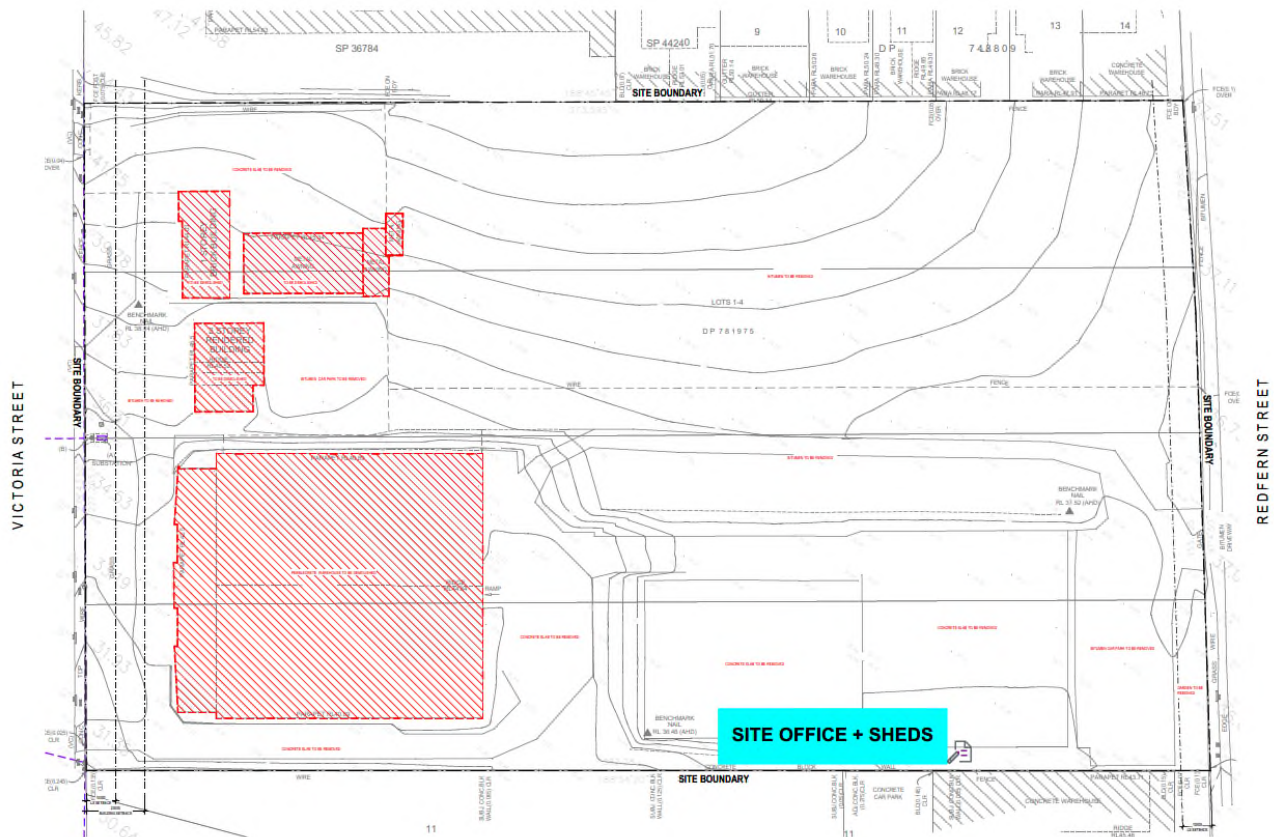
Proposed location of site office and sheds marked in blue on demolition plan.
